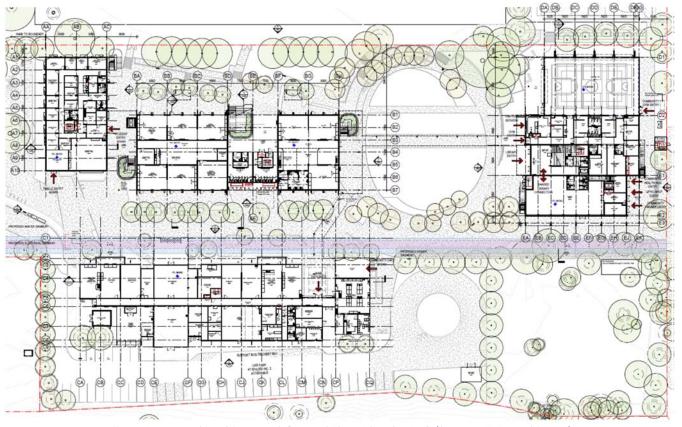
Proposed Architectural Overall Site Plan (Source: TKD Architects)
